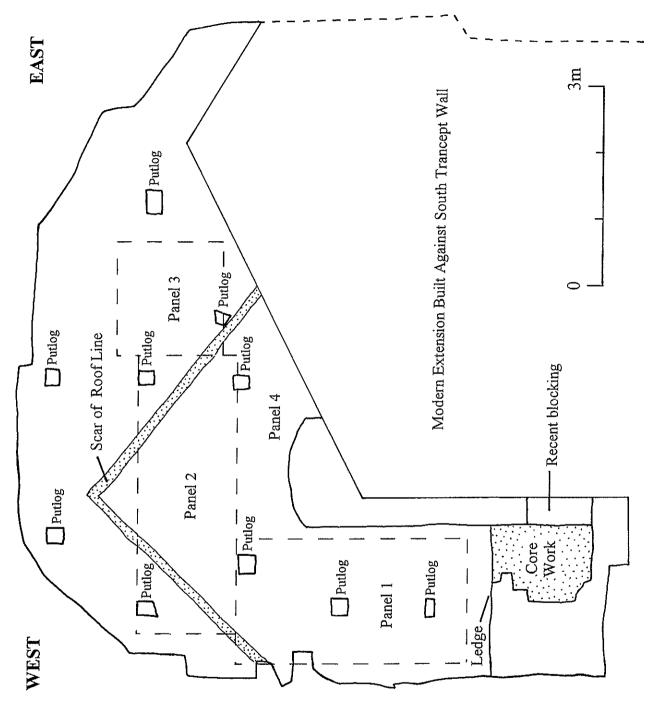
South Face of the South Transept Southern Wall (showing location of photogrametric grid).
